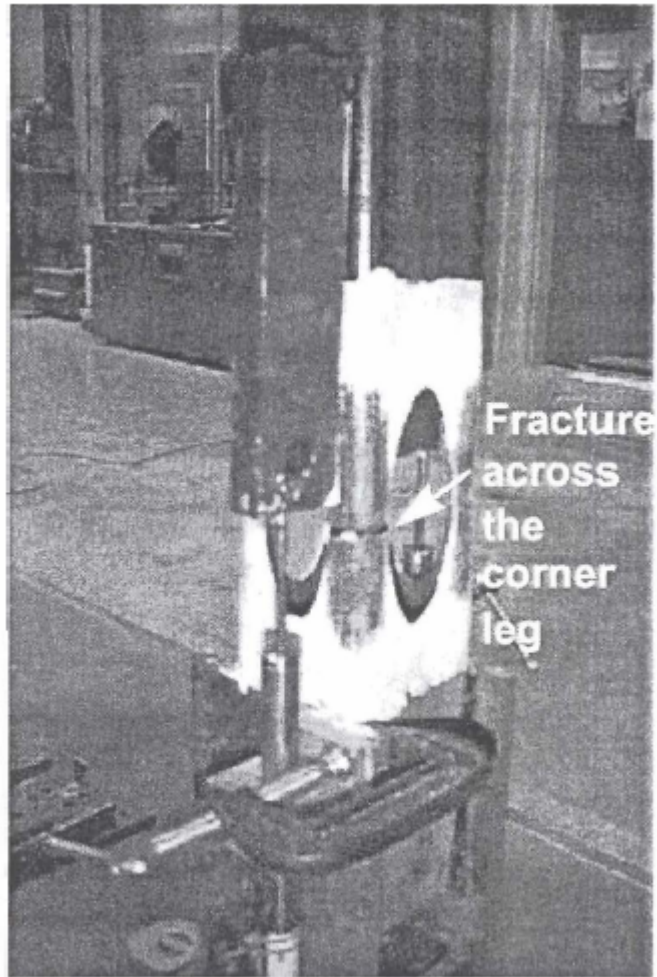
Fracture Failure of Elliptical Fuse Element [Tremblay et al., 1999].
